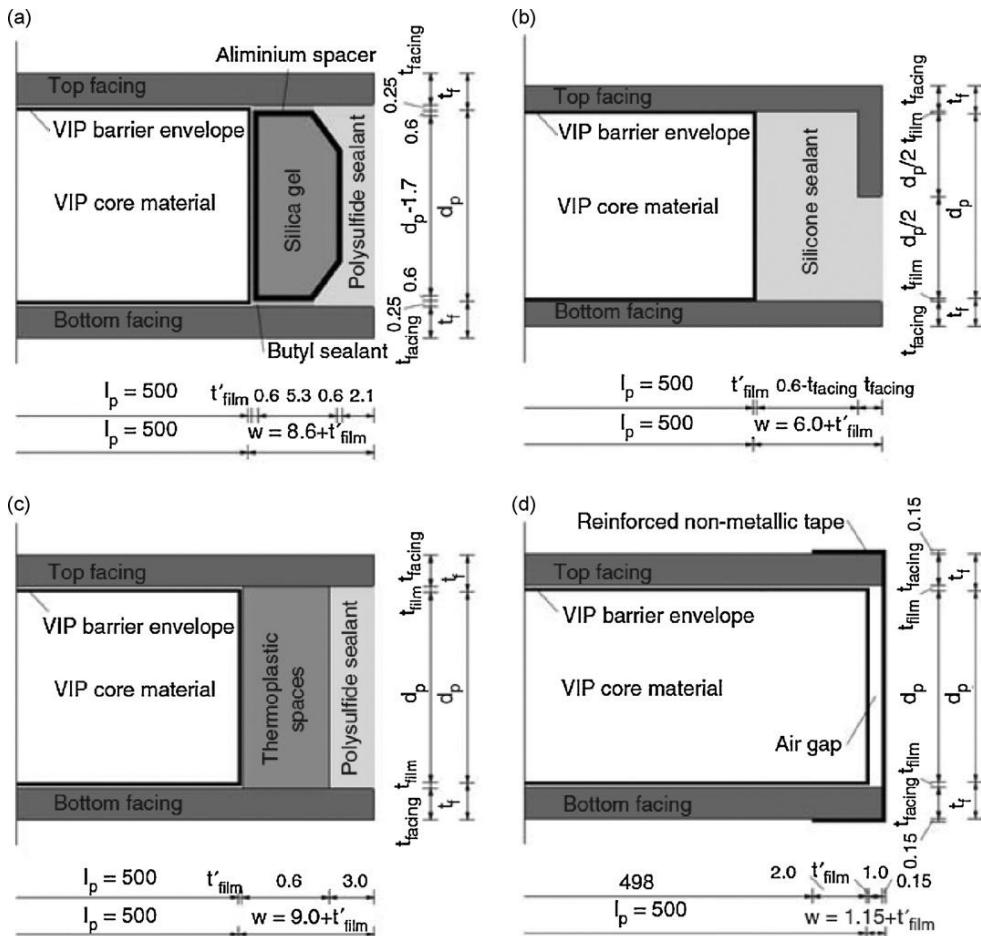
Four edge spacer construction types: (a) aluminium spacer of double glazing, (b) folded edge construction, (c) thermoplastic spacer and (d) reinforced non-metallic tape as in [6].
